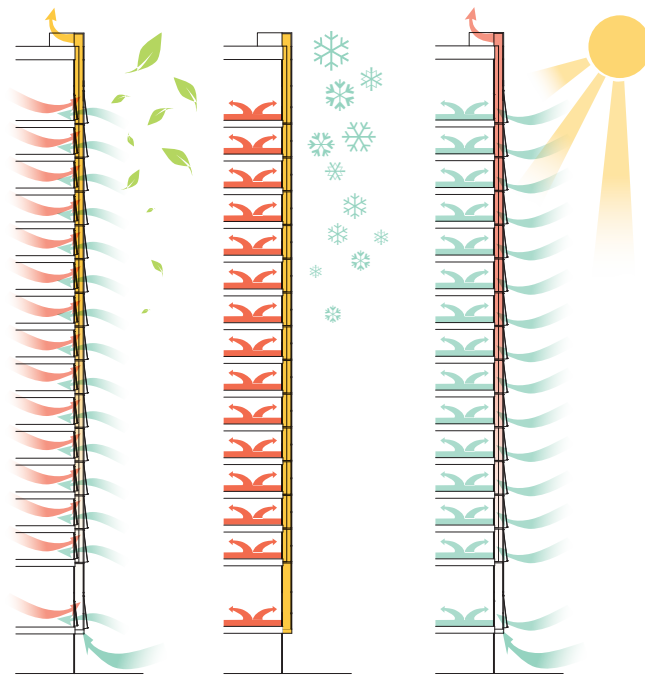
Telus building/initial proposal of facade. During the summer, the facade ventilates. During the winter the facade insulates and during shoulder seasons, natural ventilation is permitted.
